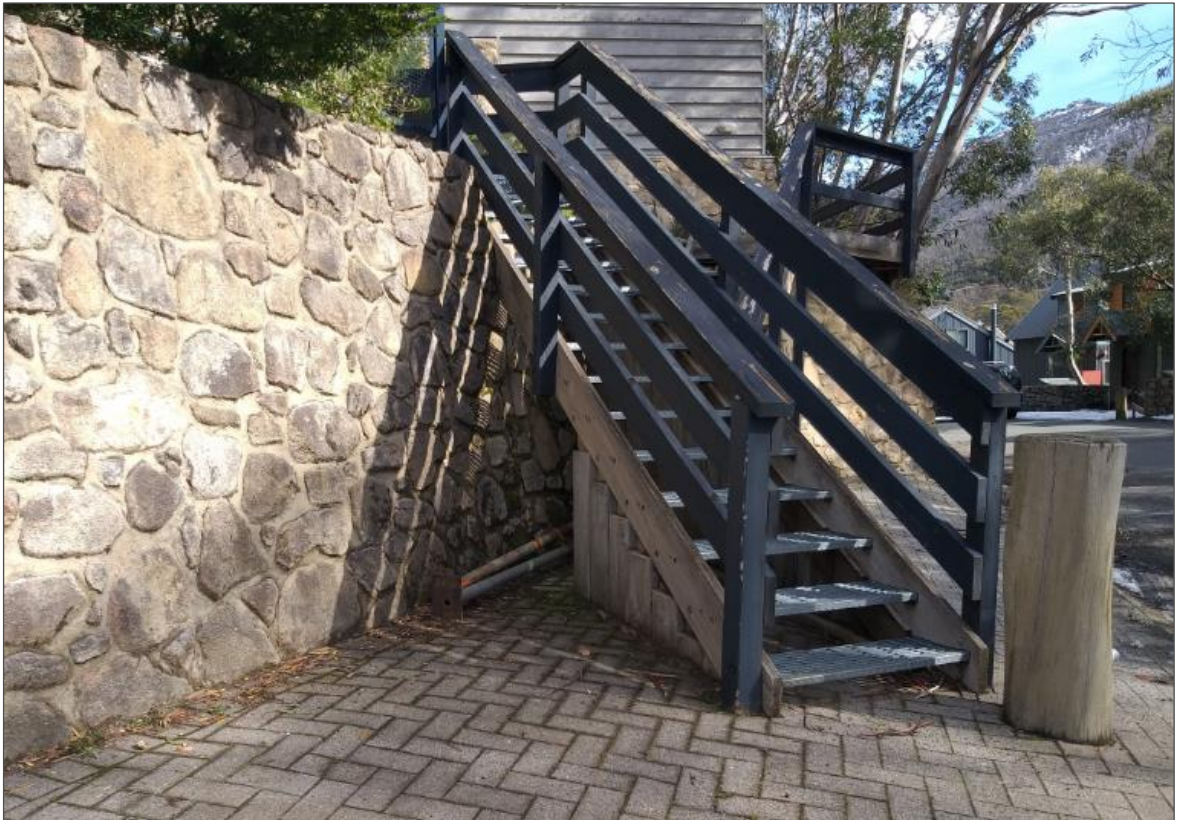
| Existing stringers and handrail to be replaced as per below works already undertaken (Source: Applicant's documentation)
